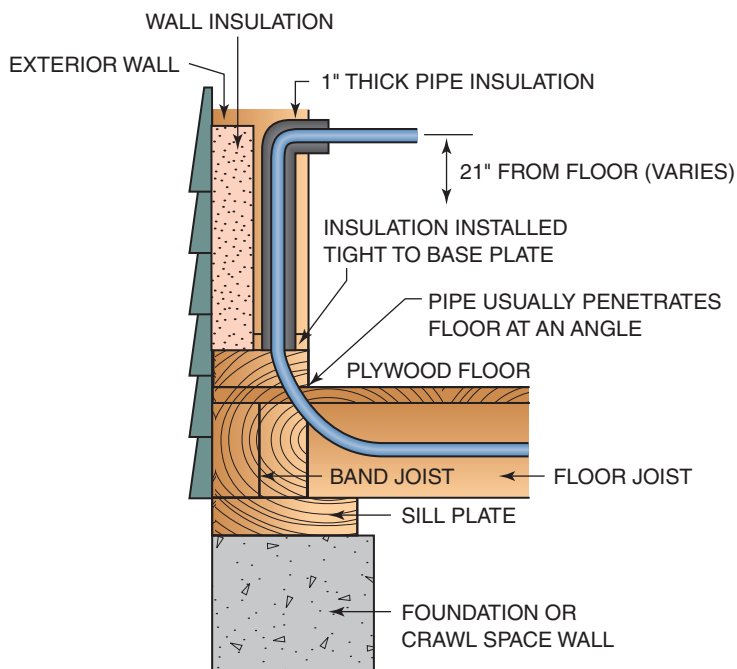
Water piping installed in an exterior wall must be protected against freezing.
